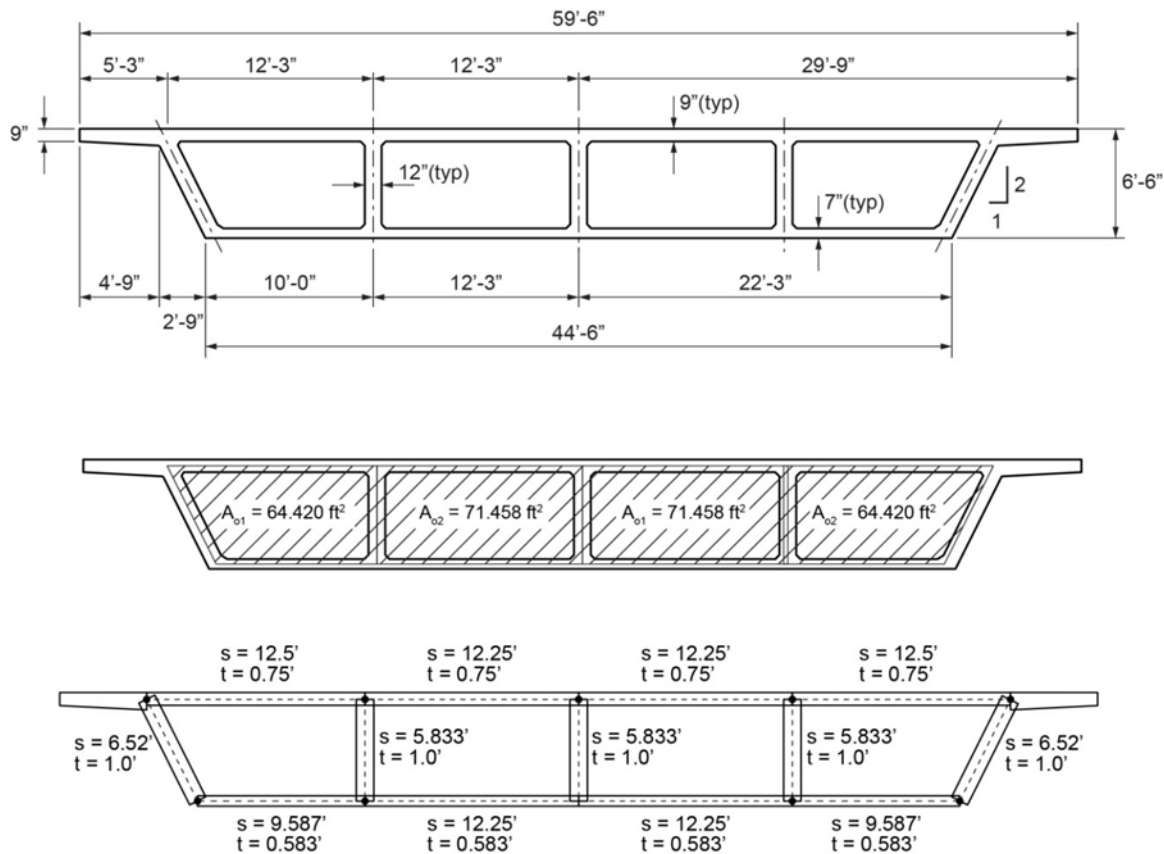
Cross Section of Bridge in Example 1, Appendix C
